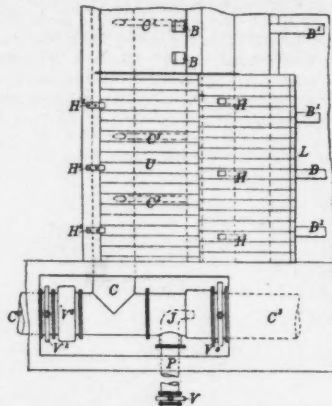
Plan of Marshall Dam, Showing Conduits and Valves with Leaves Lowered.
